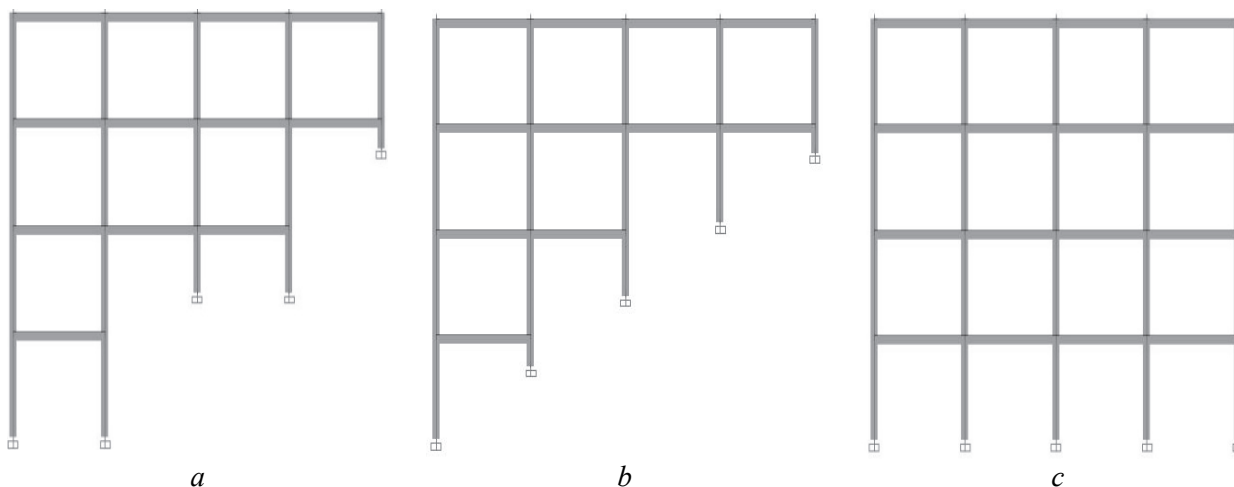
Different types of building in slope ground: a – SBB; b – SBSB; c – SB
